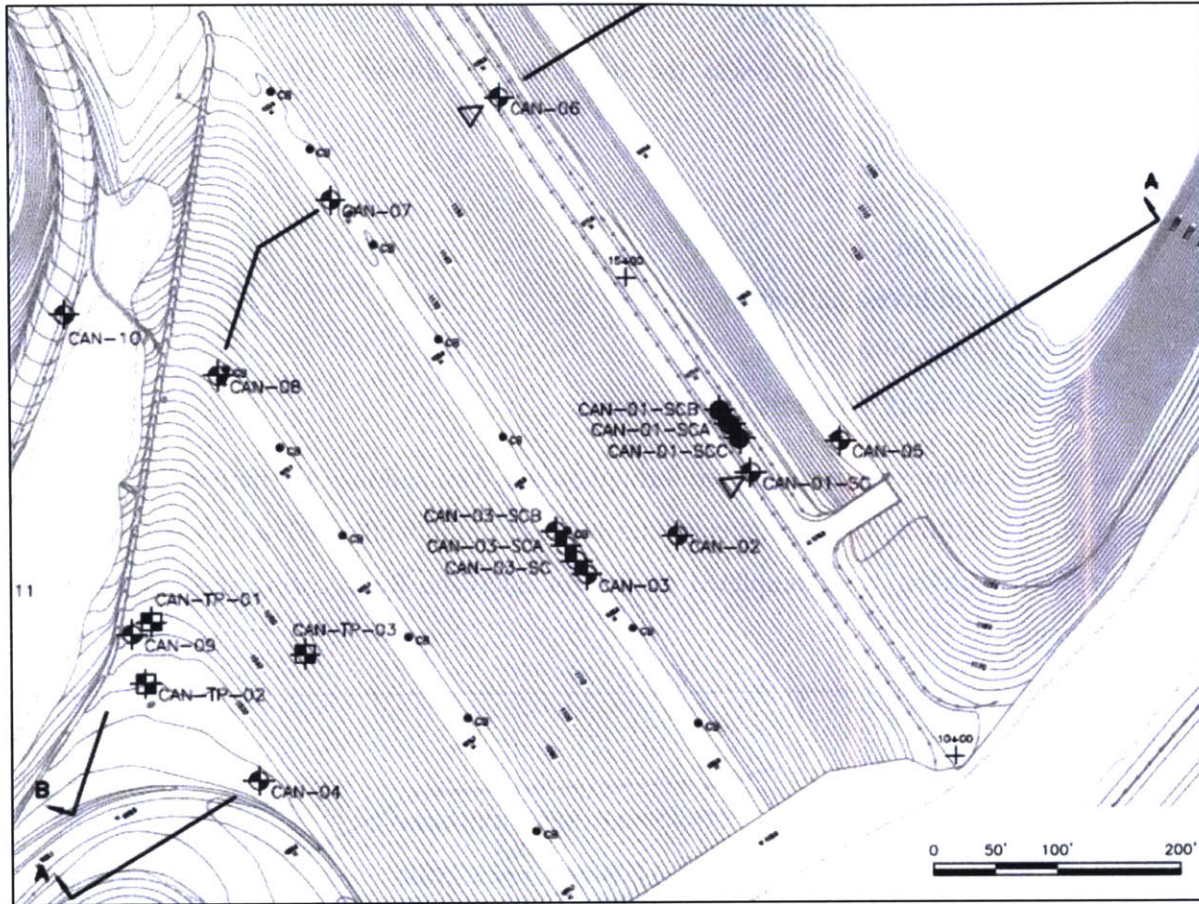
Plan view of CV dam at maximum section (A-A') showing boring locations (GZA, 2005).
